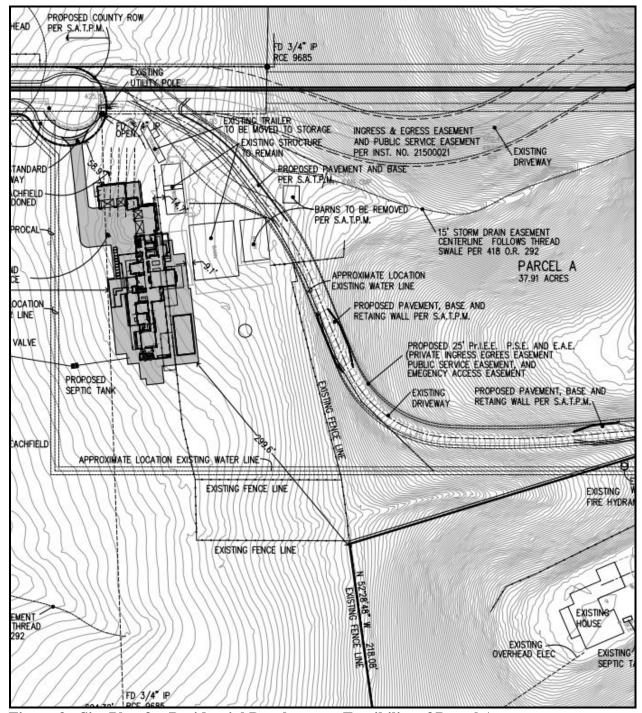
Site Plan for Residential Development Feasibility of Parcel A
